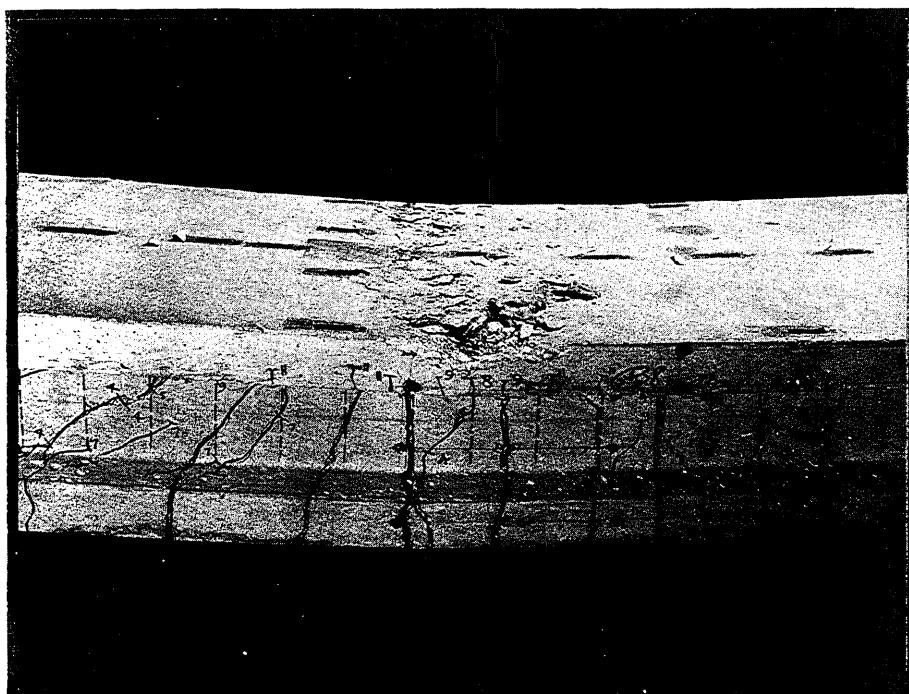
CRUSHING OF CONCRETE IN THE SLAB, BEAM G38
